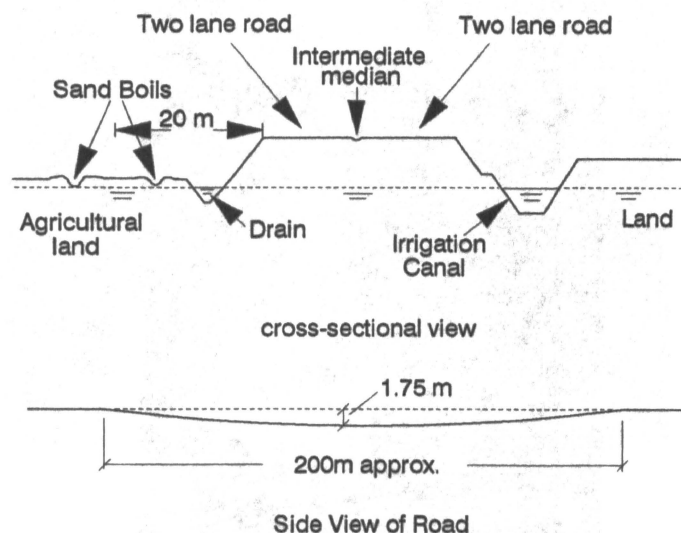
Cross-sectional view of Upper Egypt Road site; and side-view after earthquake.
